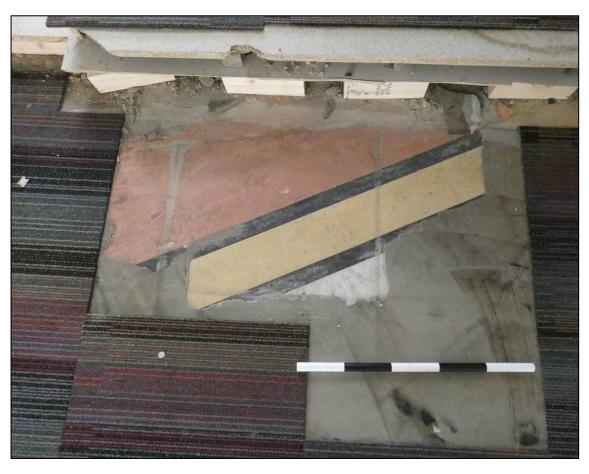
Modern office (GF4), detail of original terrazzo floor, looking NE (photo 913).
